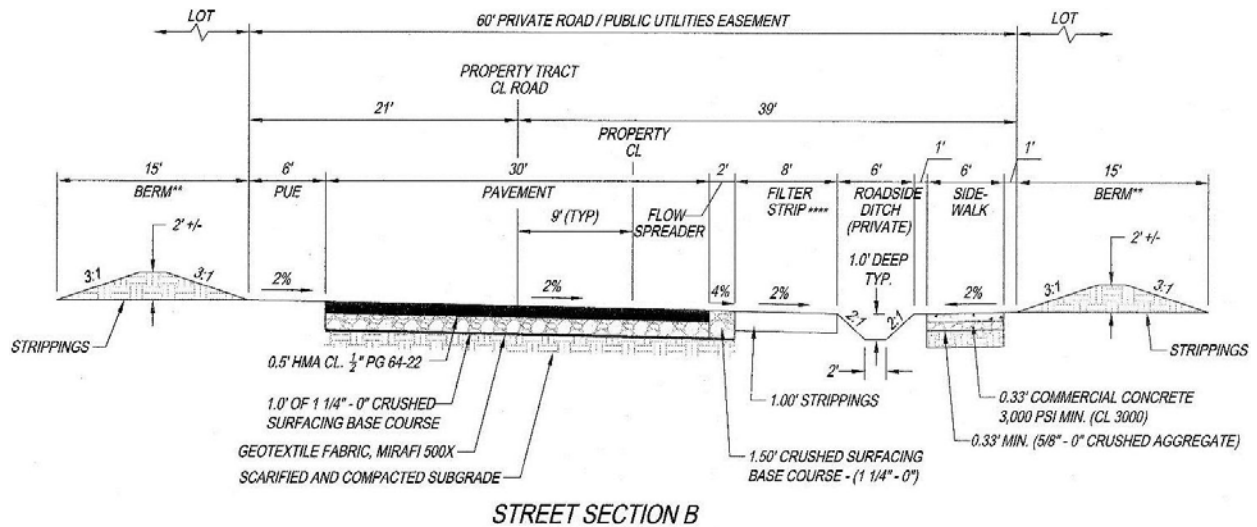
Street Section B: Water Quality Filter Strip with Private Road Section
